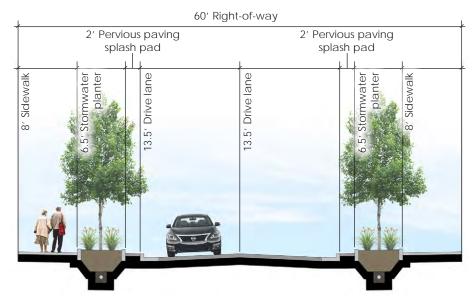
Typical urban section of what Grandview Avenue could look like with two travel lanes, stormwater planters, and widened sidewalks.
